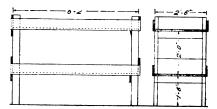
Elevation and section of bunks which were built separate in sets of four
